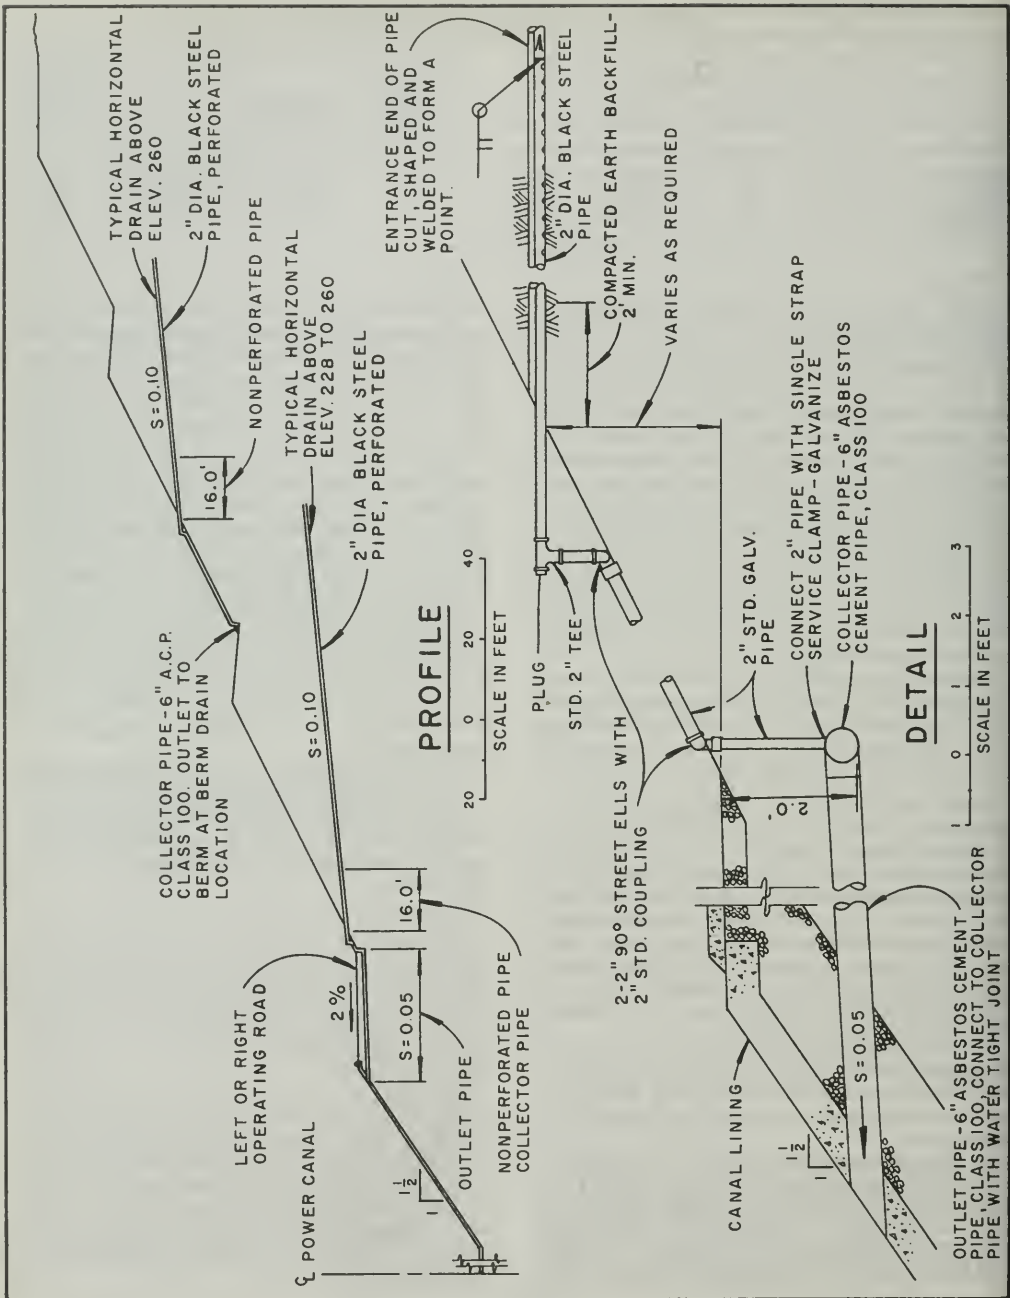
Typical Horizontal Drain—Thermalita Power Canal
